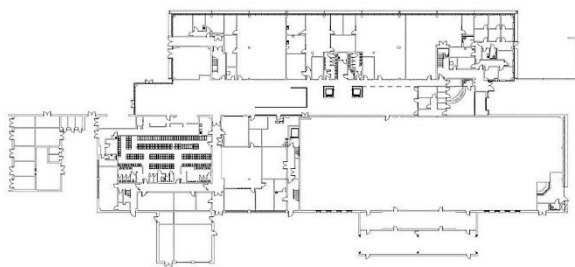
Ground floor plan of the North Kent Police Station.
